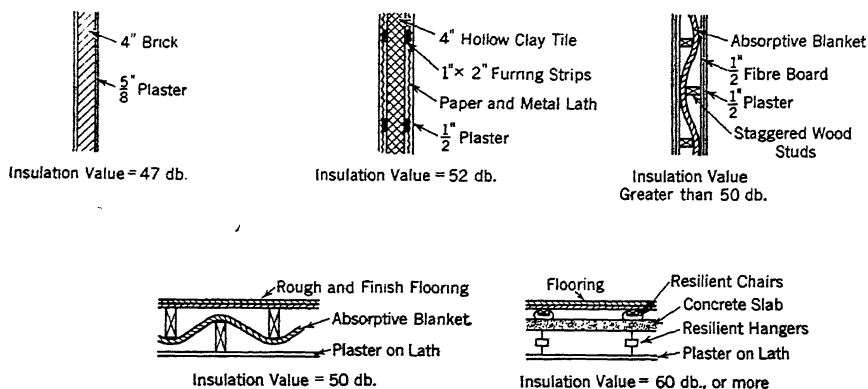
THREE WALL SECTIONS AND TWO FLOOR AND CEILING SECTIONS WHICH ARE SUITABLE FOR THE INSULATION OF EQUIPMENT ROOMS^a
